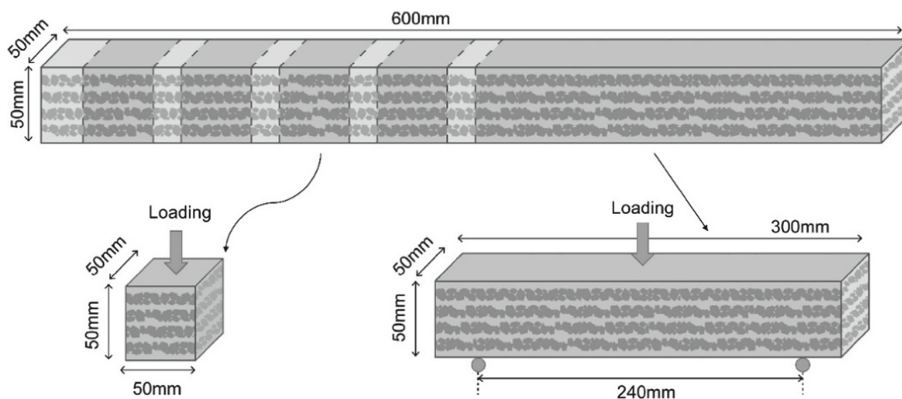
Cutting diagram and testing direction for compressive and flexural tests
